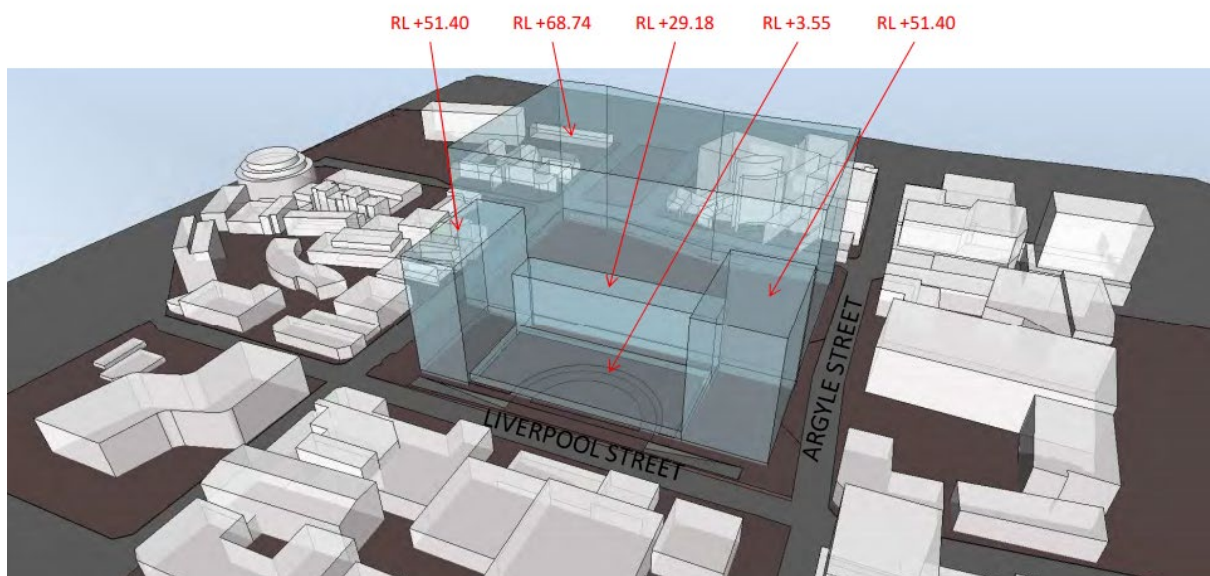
Building Envelope - three dimensional view 2
